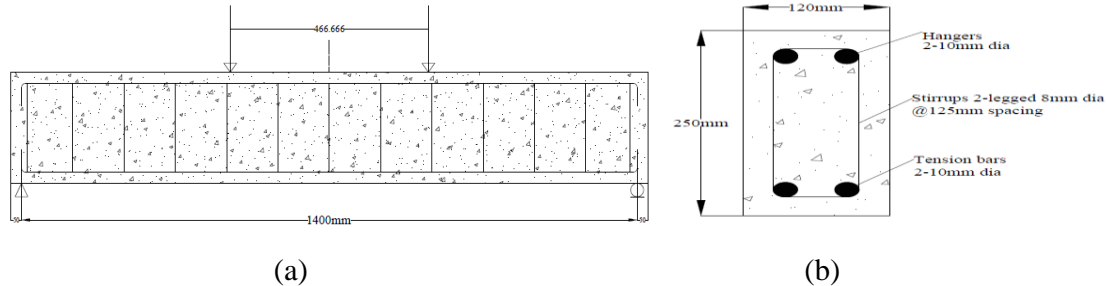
(a) Longitudinal Section (b) Beam Cross Section
